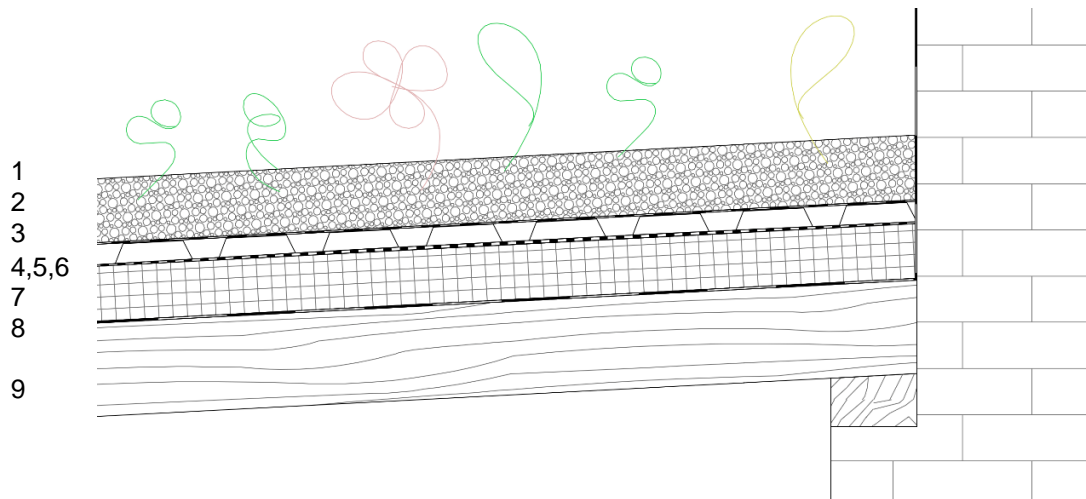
Refurbishment proposal #3 – timber board stacking roof
